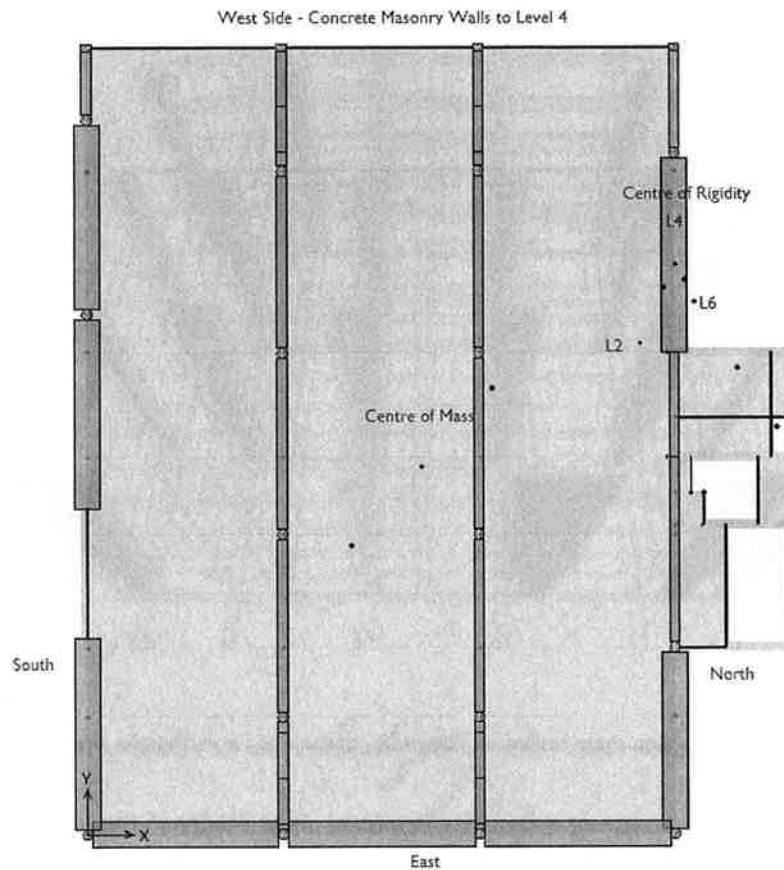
The changes in the locations of the Centre of Mass and Centres of Rigidity for the building each Floor (North Core, South Wall and Line A masonry infill walls and secondary frames on Lines 1, 2, 3, 4 and F). The centre of stiffness moved south and west, reducing the torsional response of the building, due to the effect of the secondary frames.
